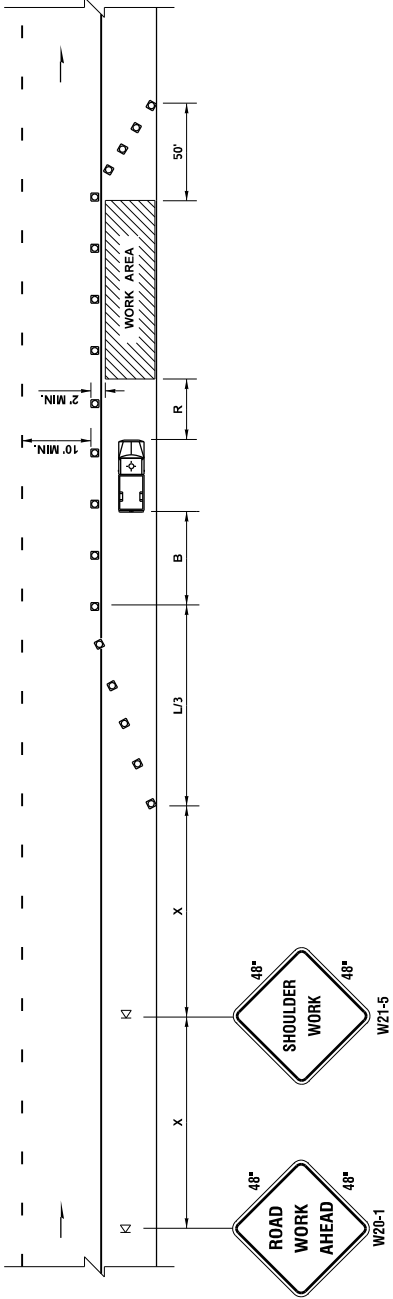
PLAN REF NO TC3	SHEET OF	TRAFFIC CONTROL PLAN
